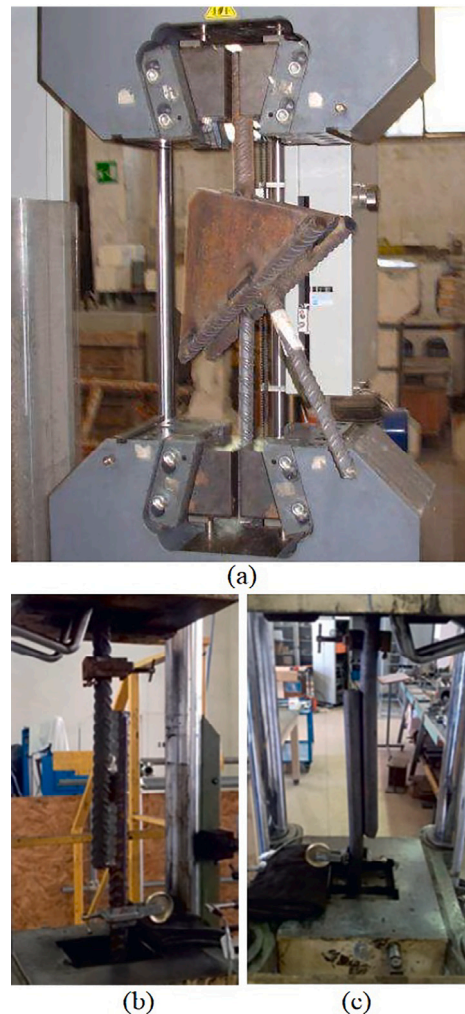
Specimens of Type 1 weld tested by: (a) La Mendola et al. [8]; (b) and (c) Caprili et al. [16].
